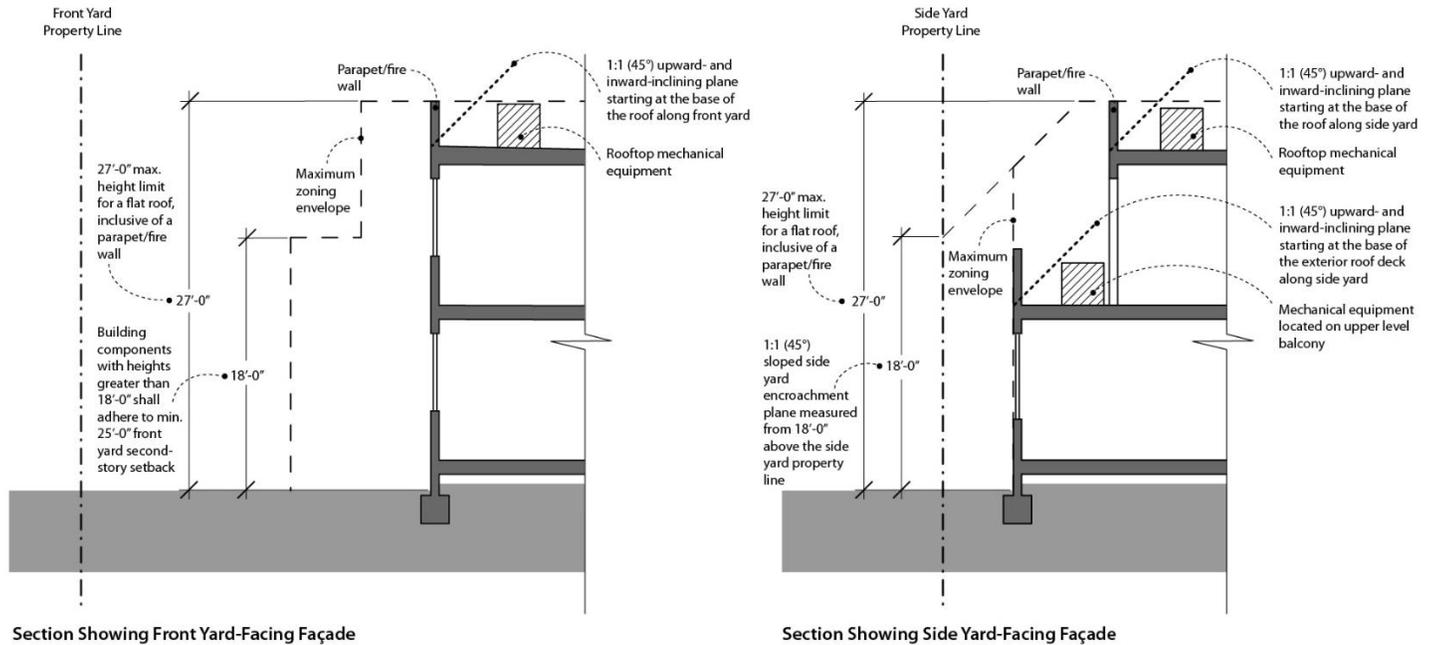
C 1:1 Allowable Placement for Roof-Mounted and Upper-Story Mechanical Equipment
